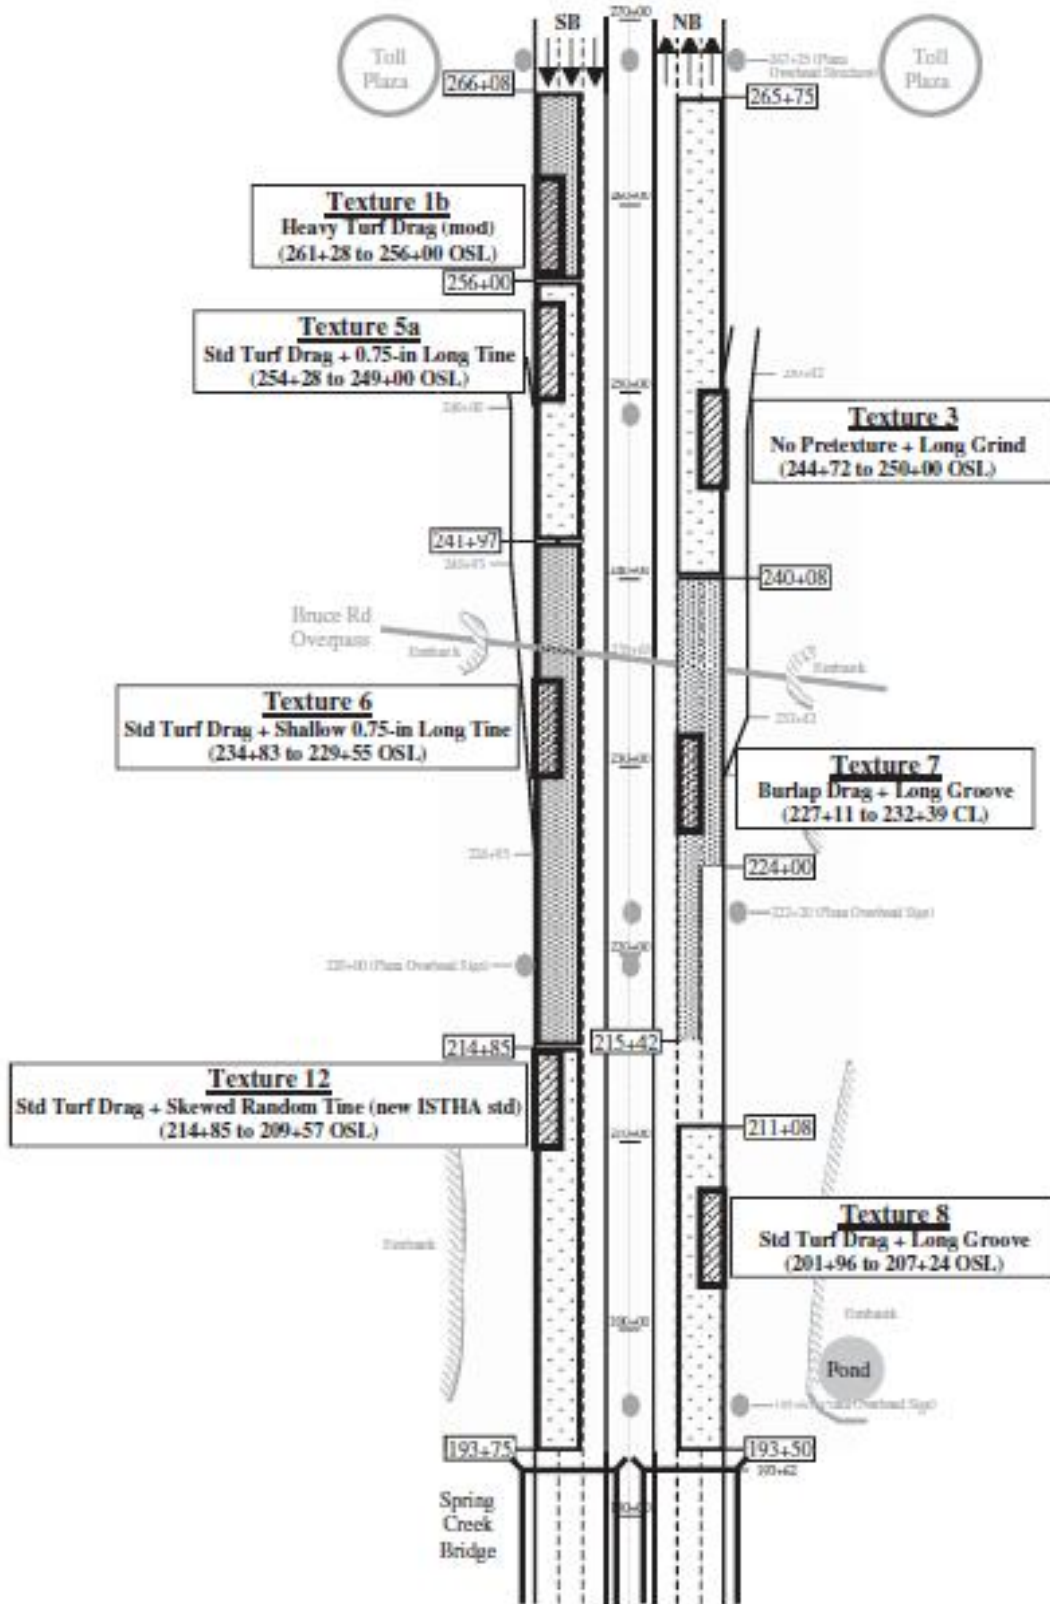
Test Sections Located to the South of the Toll Plaza¹
